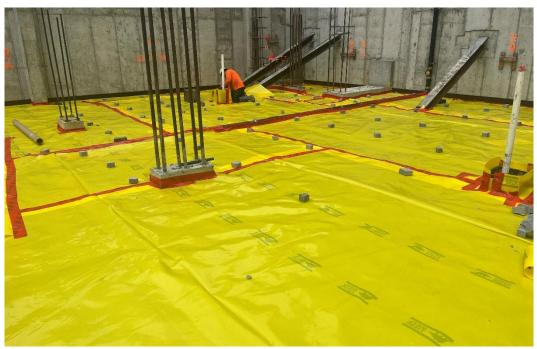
View of the contractor installing the vapor barrier for the SSDS, facing northeast.
